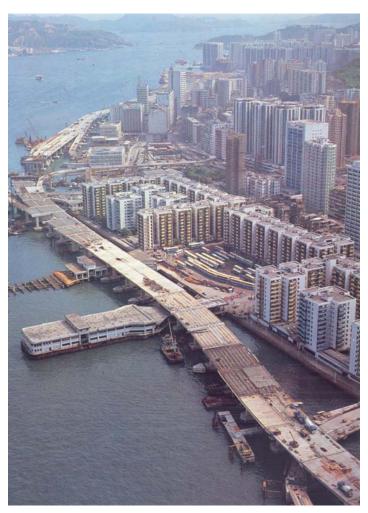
Work in progress on the deck of the elevated carriageway in North Point. A large scale bus terminal was constructed adjacent to the North Point Ferry Pier. (from Highways Office, Engineering Development Department, Hong Kong Island Eastern Corridor: Causeway Bay to Taikoo Shing Section, Hong Kong, the Government Printer, 1984, p. 6)
